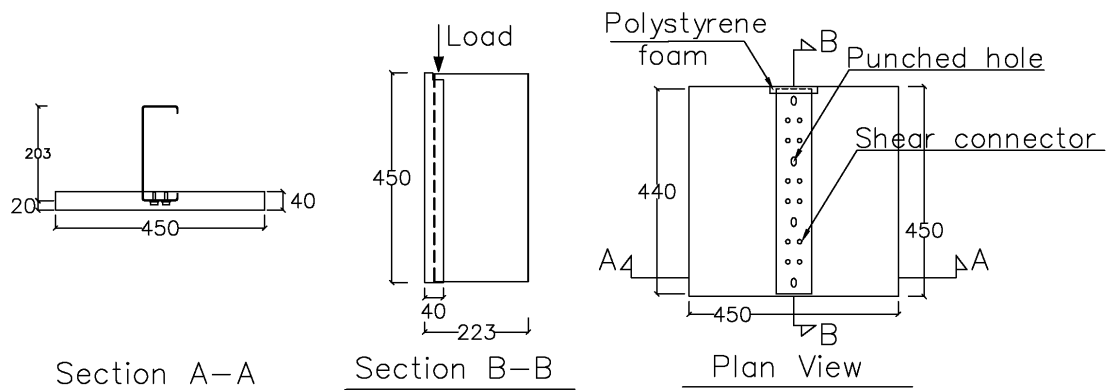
Schematic drawings of the small-scale specimen used for push-out shear test
